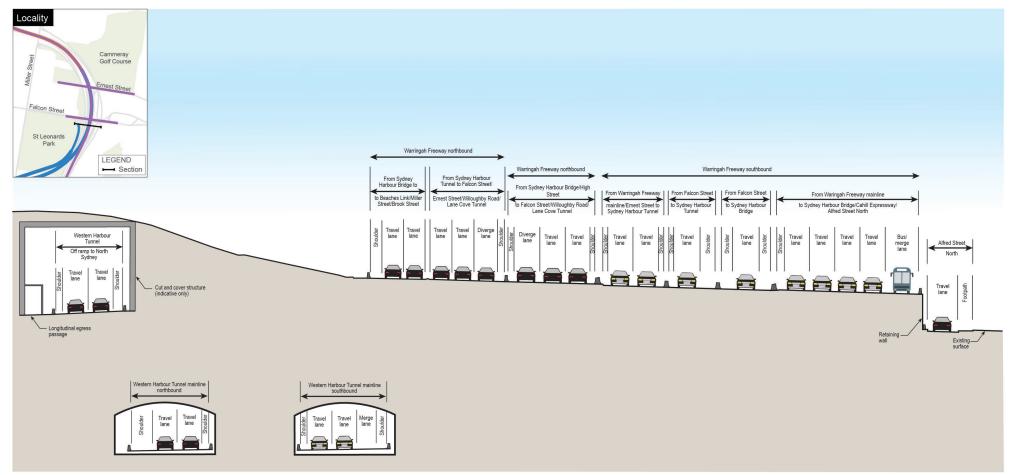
Indicative cross-section through the connection between the Western Harbour Tunnel and the Warringah Freeway Upgrade – overview
